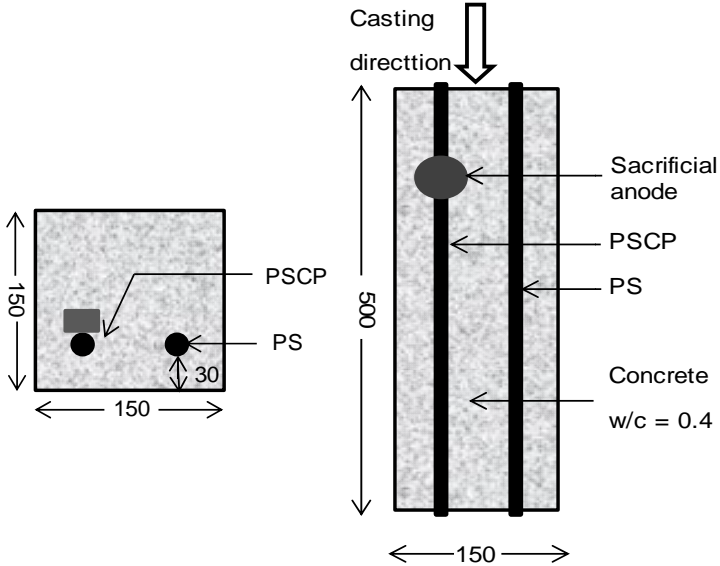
Detail of specimen cracked concrete (unit: mm)
